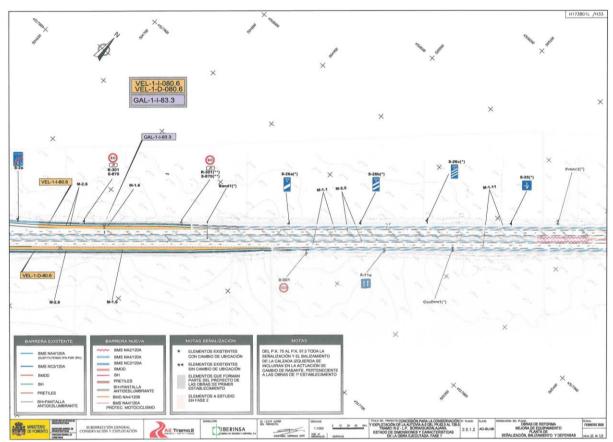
Indicative layout plan of a small section of A2 including information on signalling, geometry, etc.
